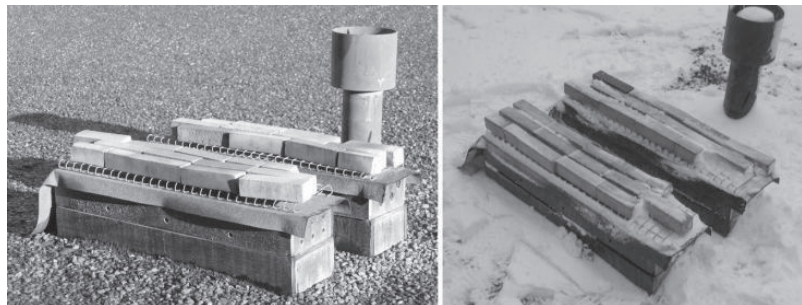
Concrete specimens stored outdoors and used for monitoring the natural carbonation.
